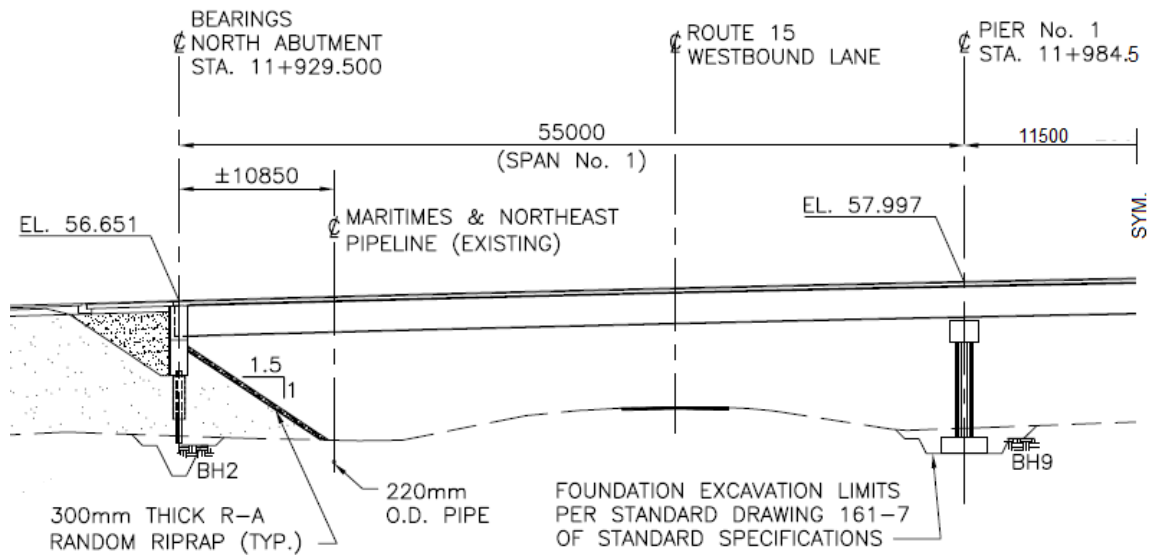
Partial Elevation of Scoudoc Bridge. (NBDTI, 2009)
